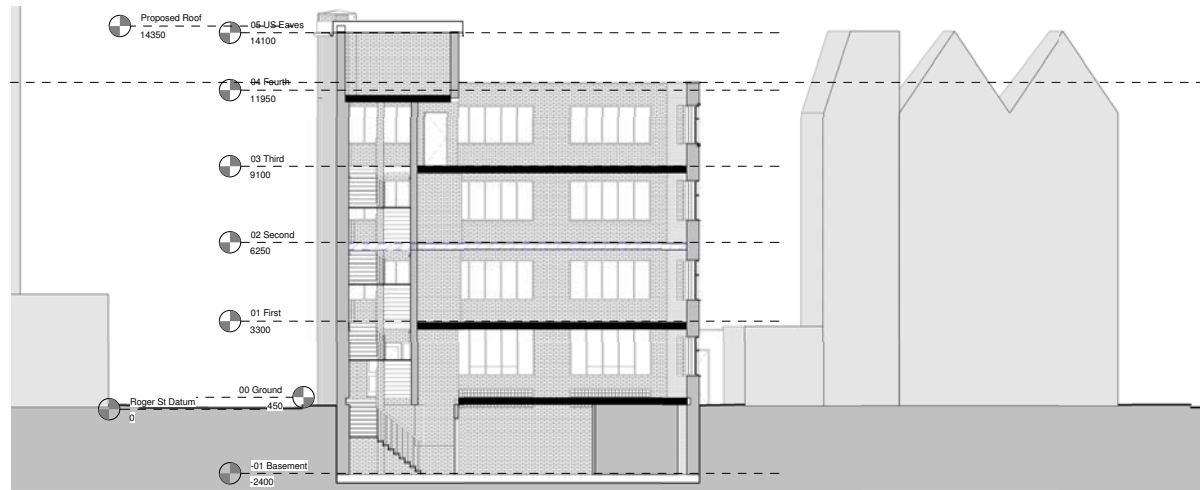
Existing longitudinal Section _ towards Roger Street
